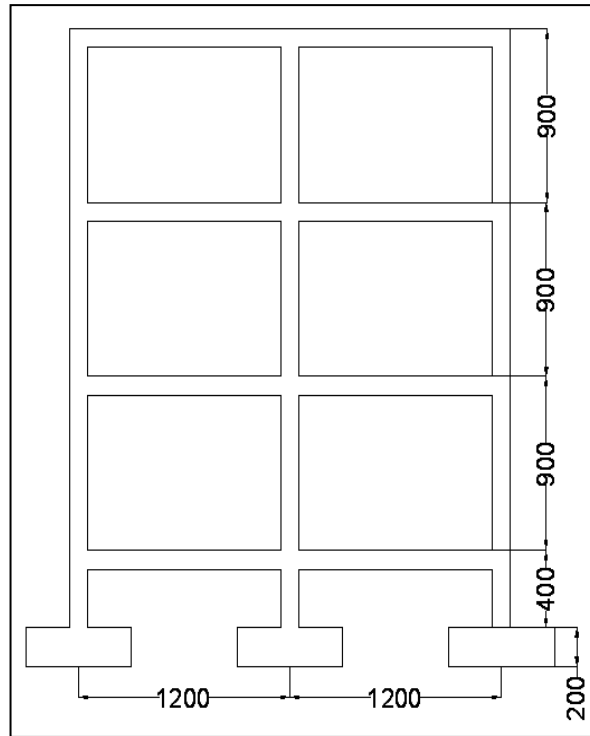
Elevation of RC structure (Chetan et al. 2009)
